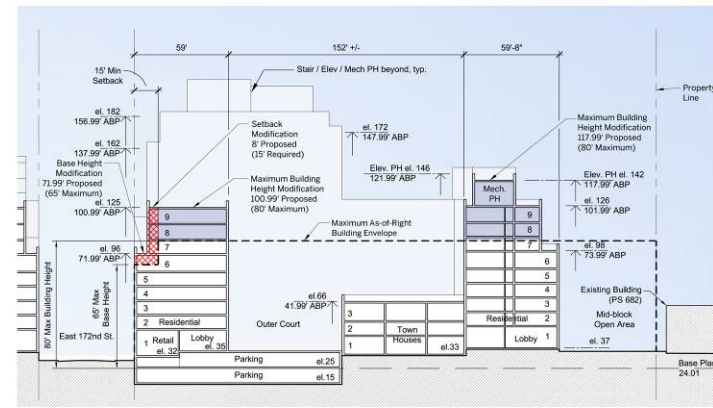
C: Buildings 1A / 1B - Proposed Height and Setback Waivers (Sections)
